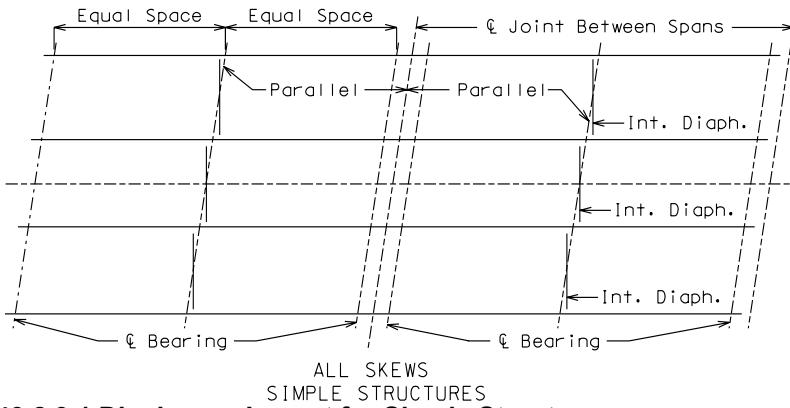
Diaphragm Layout for Simple Structures
